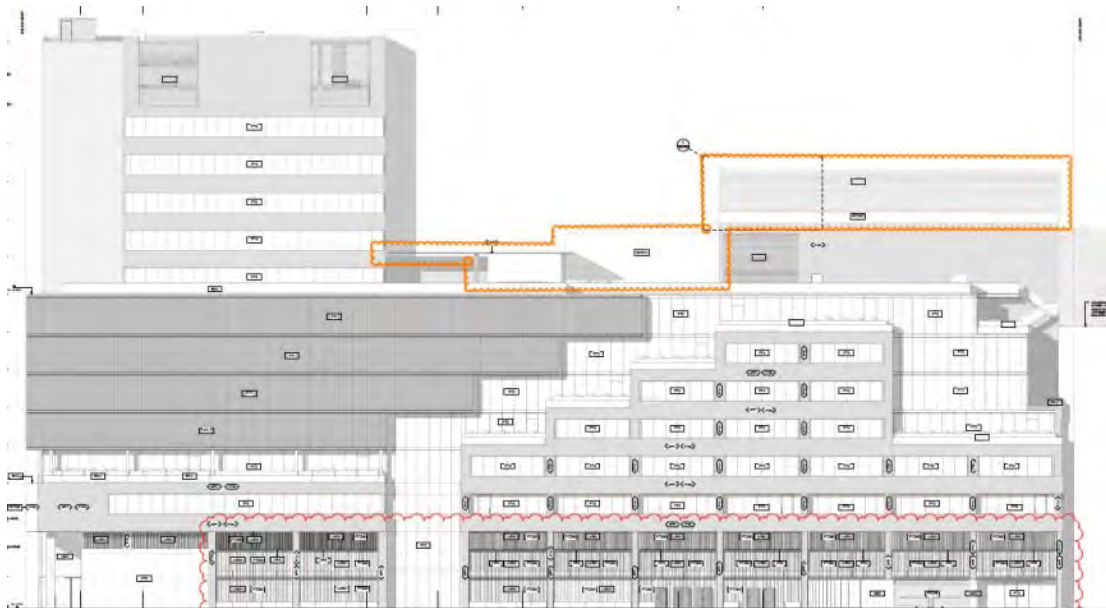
Proposed North (left) and East (right) Elevations depicting extent of non-compliance of existing building with the setback requirements of DDO10
